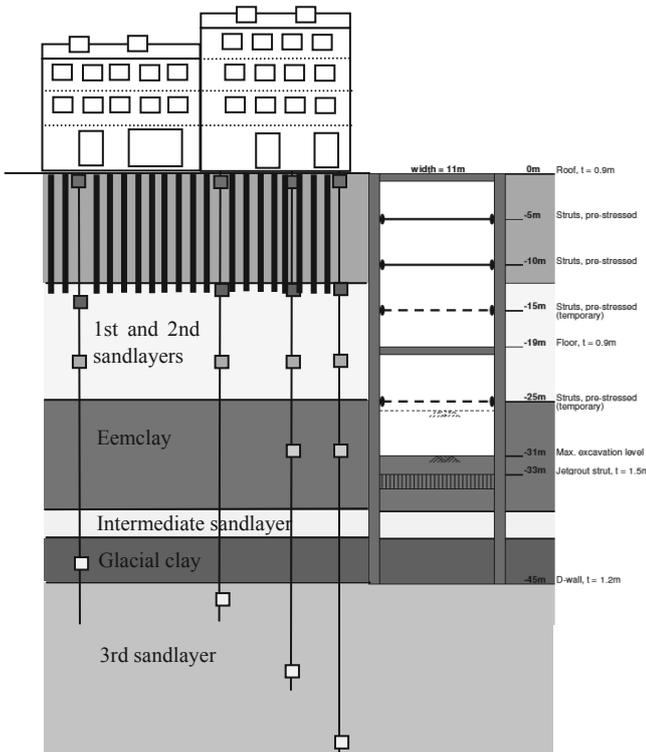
Cross section of Ceintuurbaan Station with soil profile and extensometer locations
